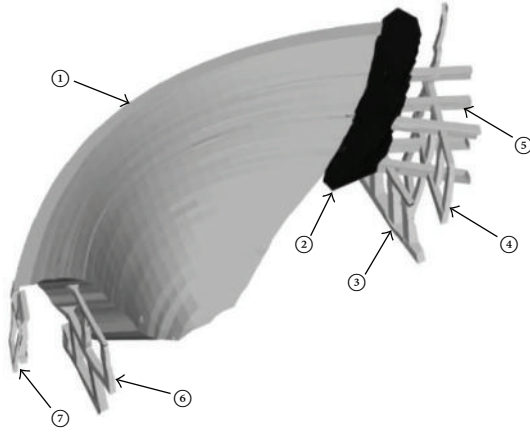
Schematic of the typical reinforcement measures used at the Jinping-I arch dam. ① The hyperbolic arch dam; ② the concrete seating replacement; ③ the concrete grids and hole-plug replacement for the fault f5; ④ the concrete grids and hole-plug replacement for the lamprophyre dike X; ⑤ the concrete shearing resistant holes; ⑥ the concrete grids and hole-plug replacement for the fault f14; ⑦ the concrete grids and hole-plug replacement for the fault f13.
